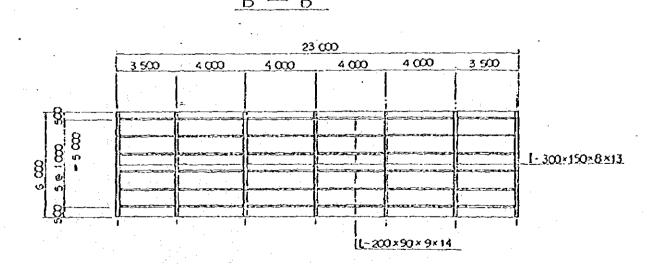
Structural Details of Steel Caisson - 2
